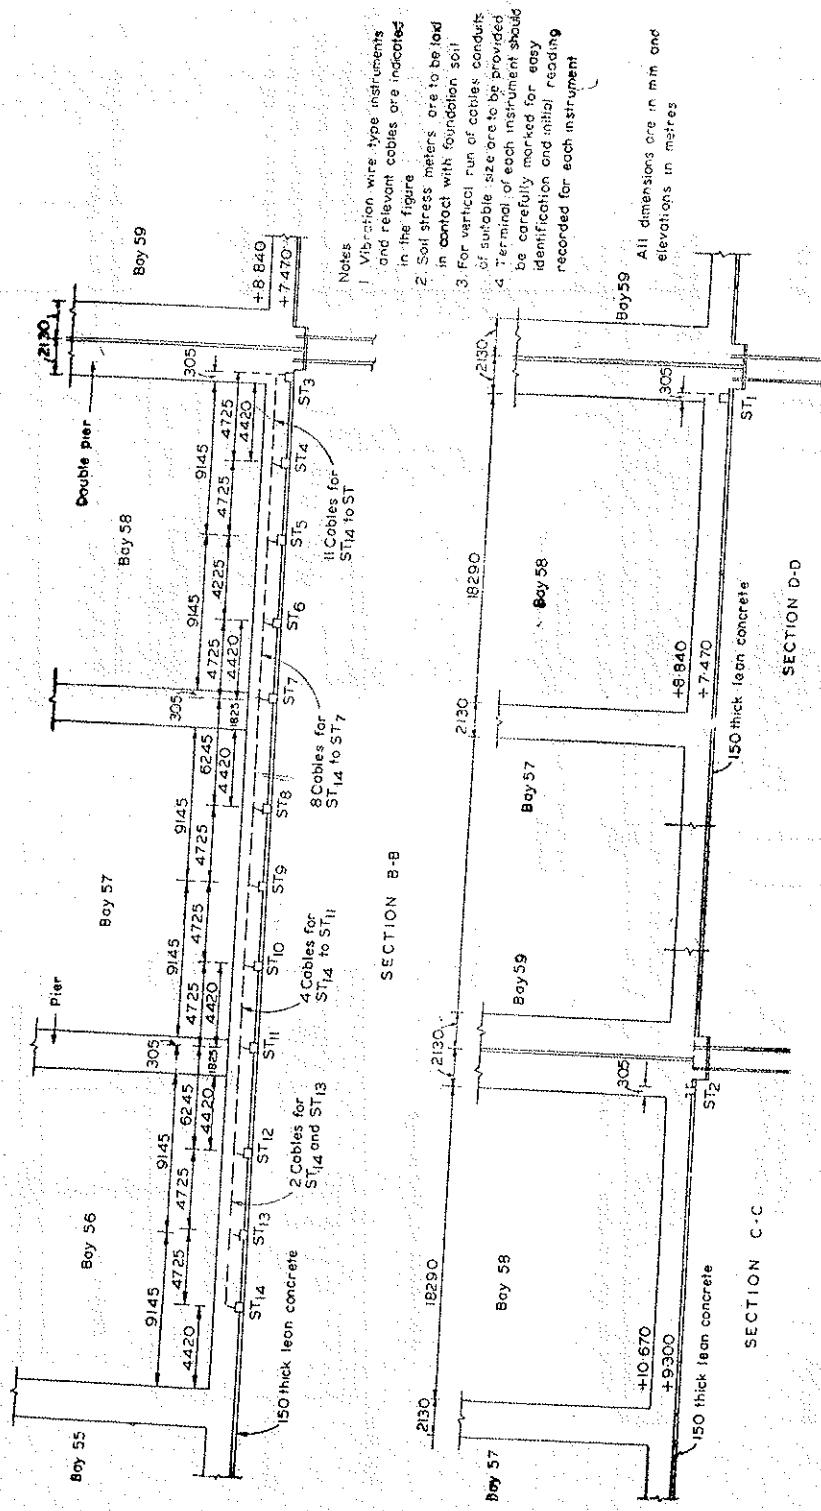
Typical Details of Location of Instruments and Recording Point
